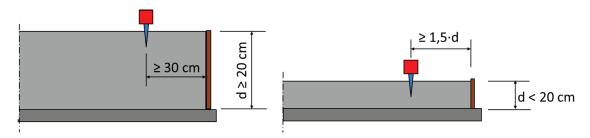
Minimum distance of the sensors from the side walls of the formwork
